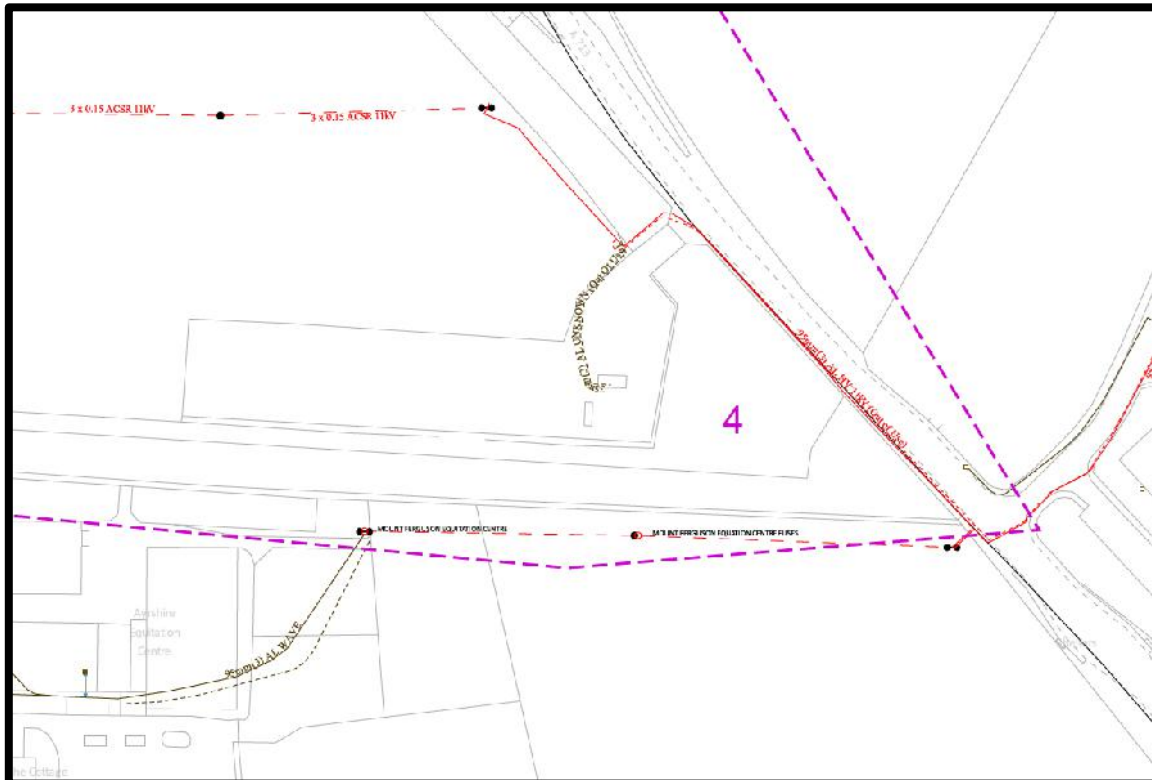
Extract from SPEN Services Plans – underground and overground Cables noted within site
